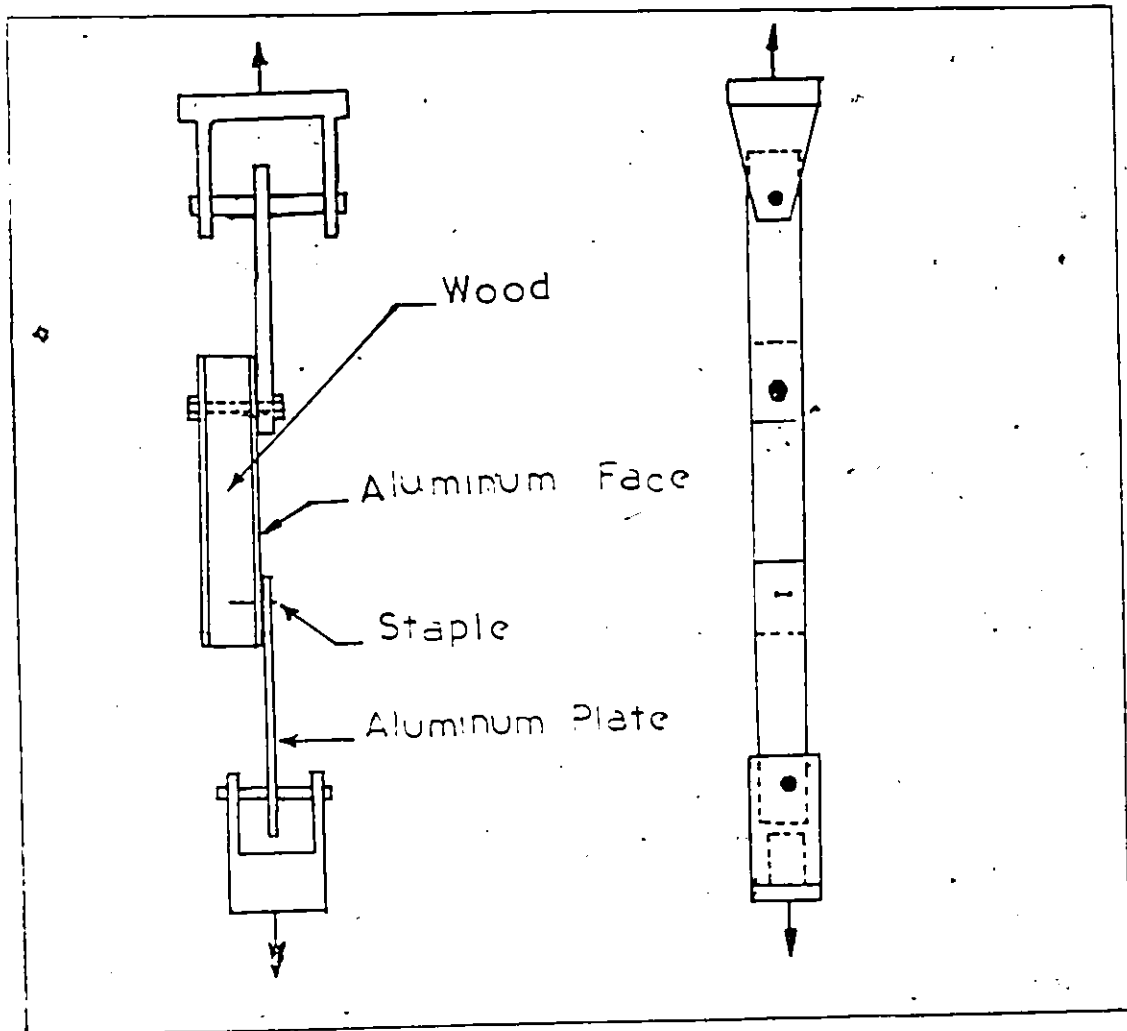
TESTING ARRANGEMENT FOR STAPLED CONNECTION
